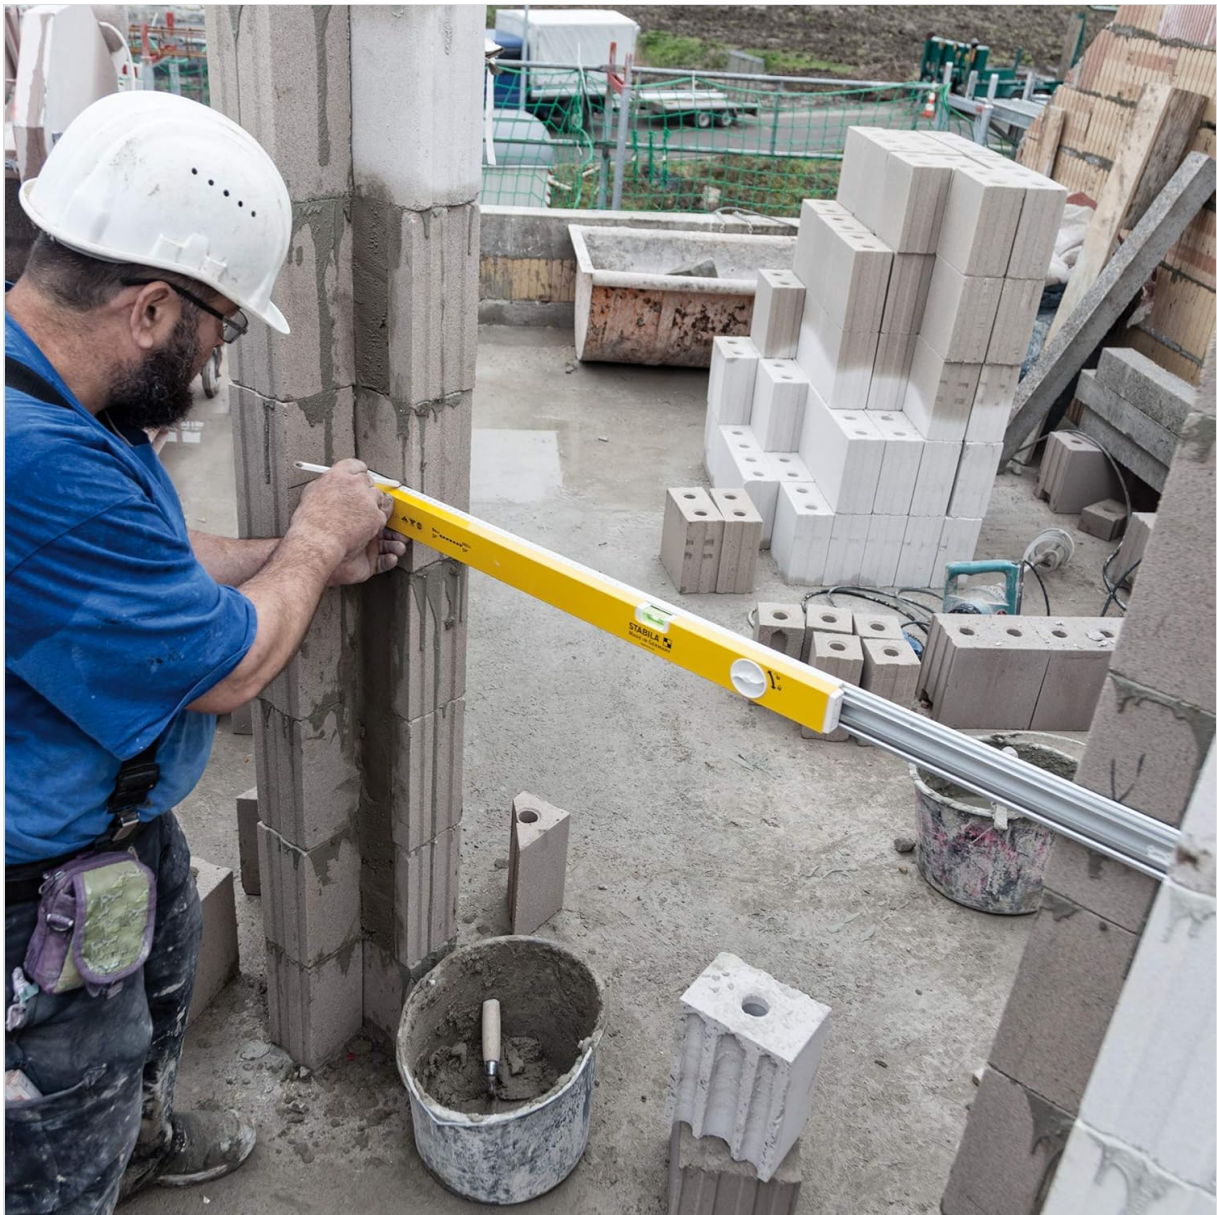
A construction worker using the Stabila extendable level to verify the vertical alignment of a concrete block wall.
